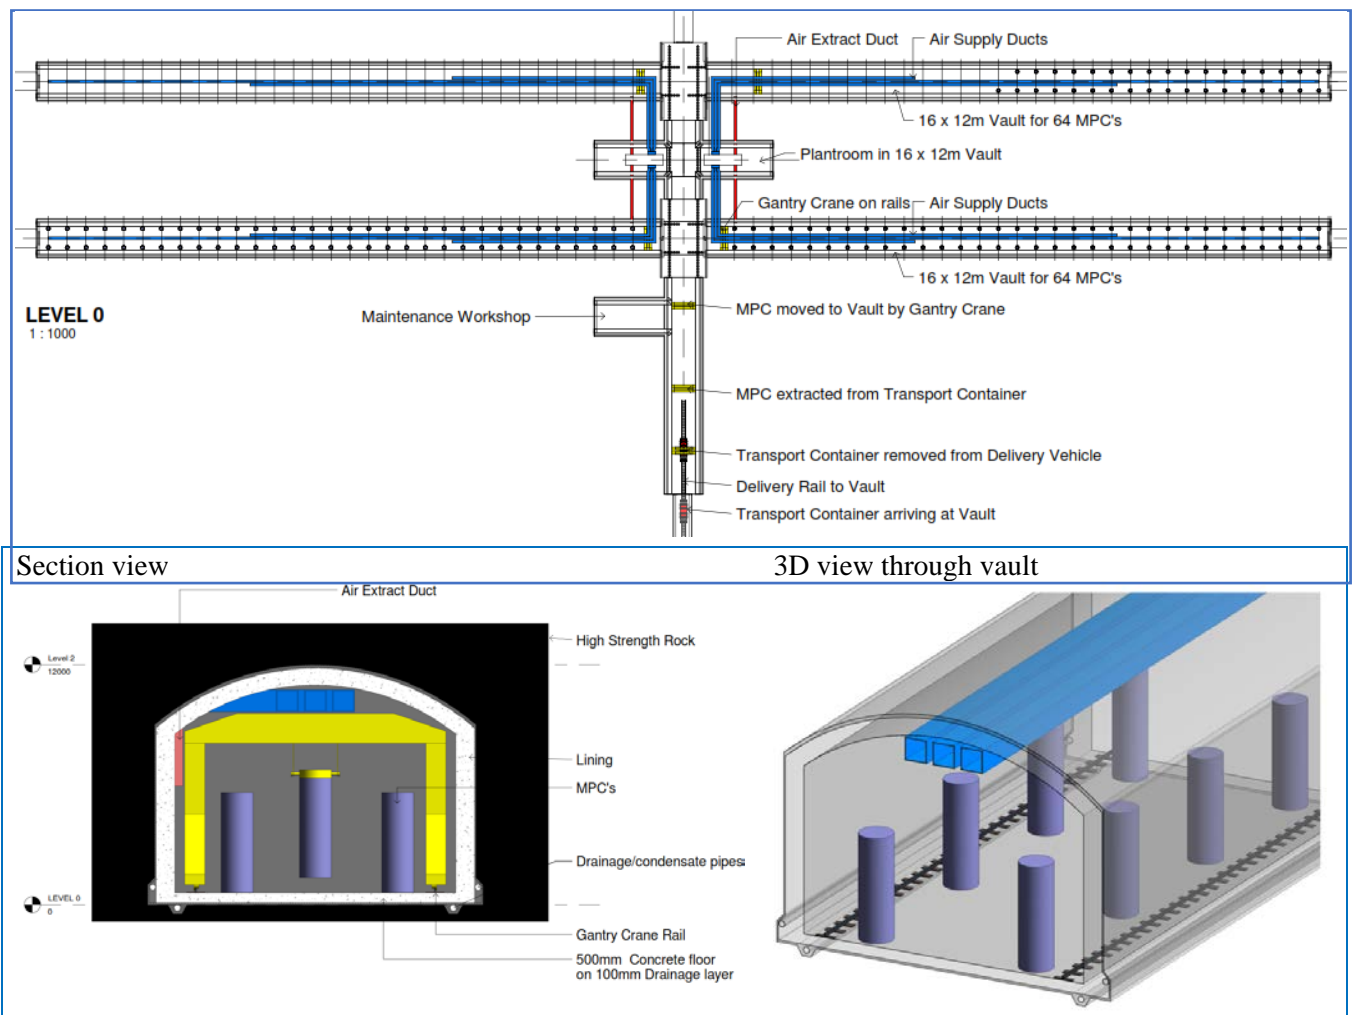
Plan, section and 3D views of the RETrievable VAult (REVA) concept design in Higher Strength Rock (HSR)
